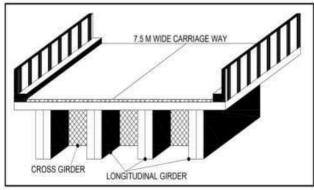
TYPICAL SECTION OF T-BEAM BRIDGE
